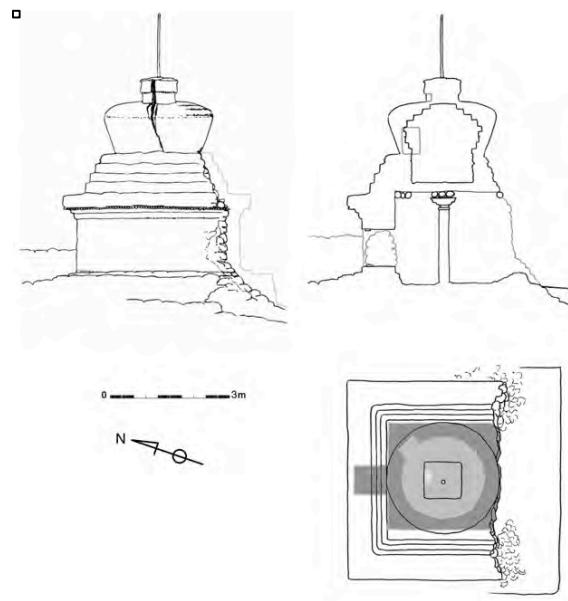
Elevation and section of Markha chorten. (Vernier 2009).
